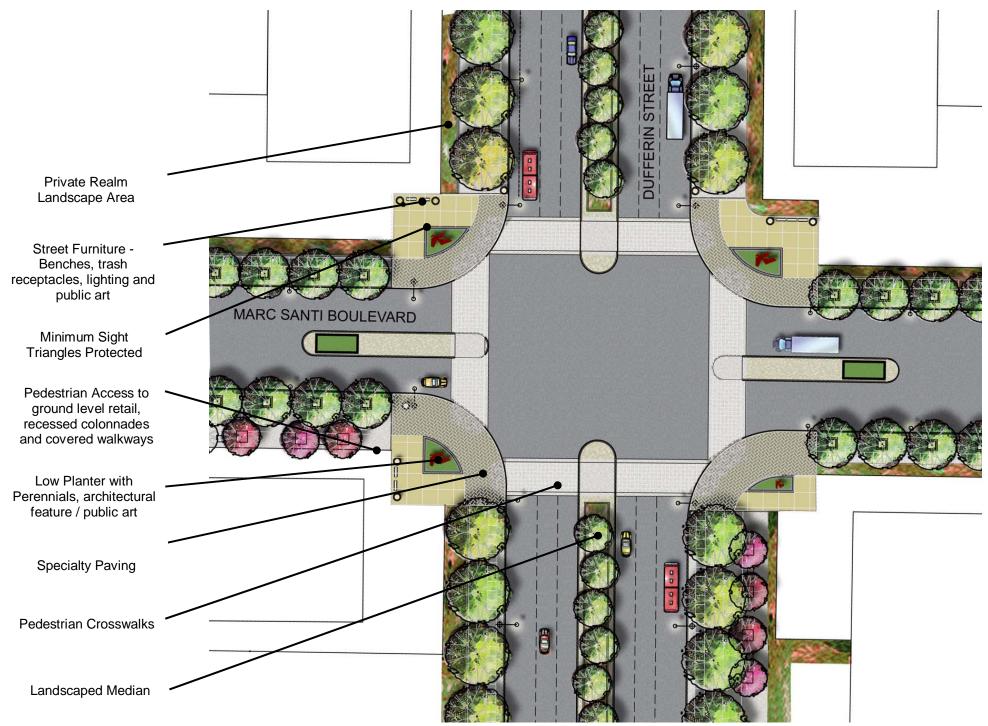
Typical Treatment for the Intersection of Dufferin Street and Marc Santi Boulevard
